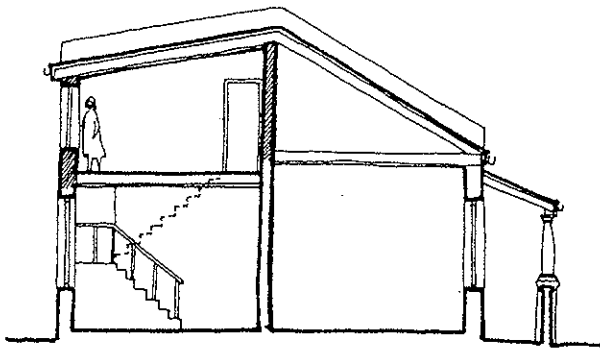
Raising the eaves at the back of the house can provide loft accommodation without affecting the streetscape.
